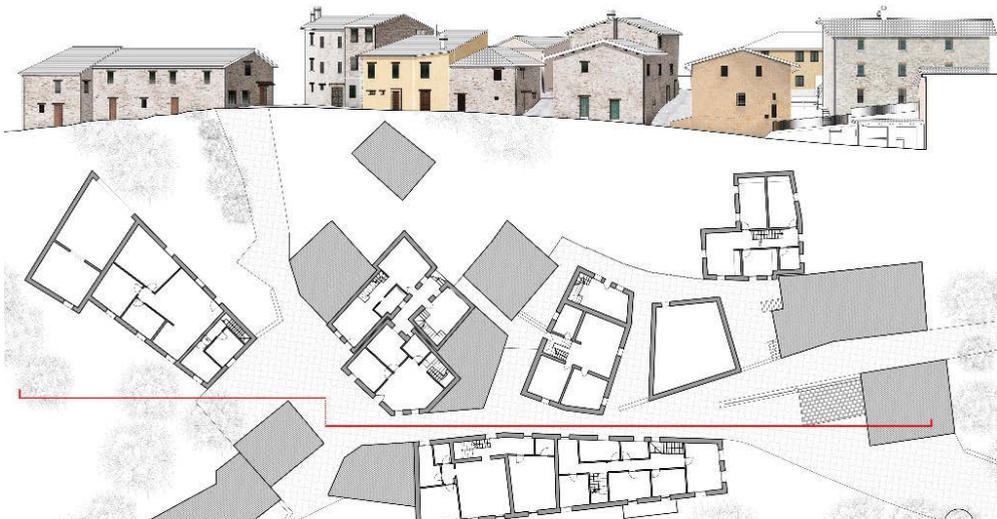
Plan and elevation at the project prefiguration (Source: Archliving, 2021, with editing by Cristiano Tosco, 2022)
